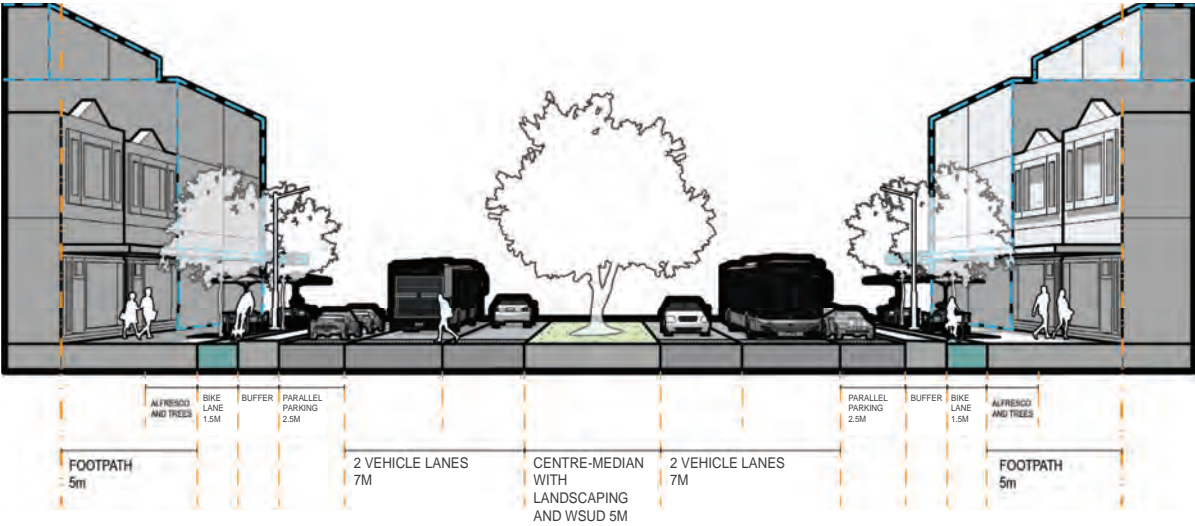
Indicative cross-section High Street (between Sladen Street and Cranbourne Railway Station) - subject to further investigation and detailed design
